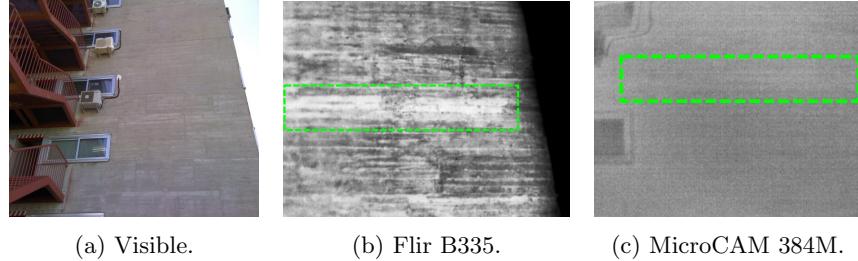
Assessment of a thermal loss, highlighted in green, in a façade slab.
